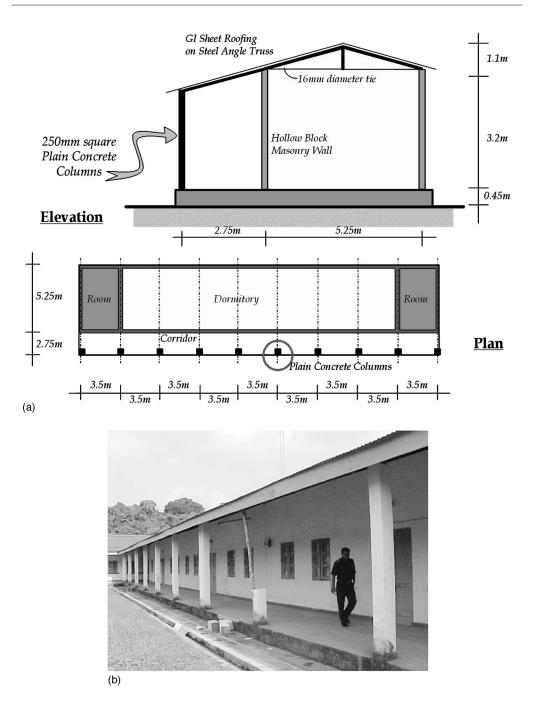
Military barracks in the Army land area at Campbell Bay in Great Nicobar Island: (a) typical dimensions of a unit, (b) collapse of a plain concrete corridor column (photo: S. Dash).
